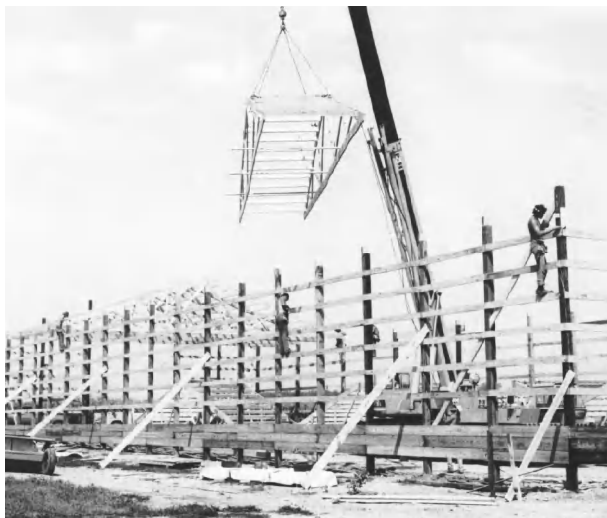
Poles provide economical foundation and wall systems for agricultural and storage buildings.
